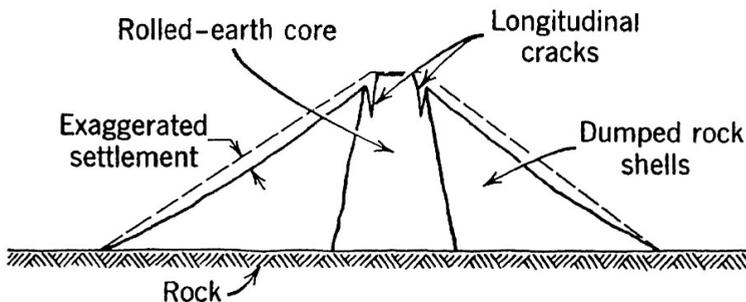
Longitudinal differential settlement cracks between embankment zones (Sherard *et al.*, 1963).
